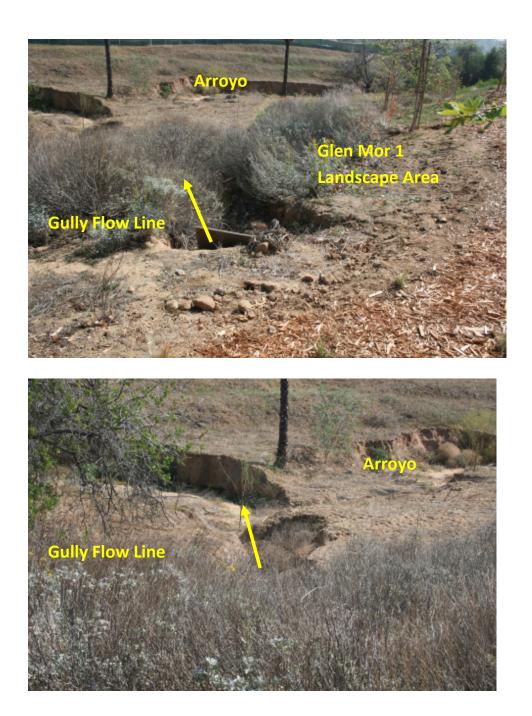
Reach 3 - Existing Gully and Arroyo Site Conditions
